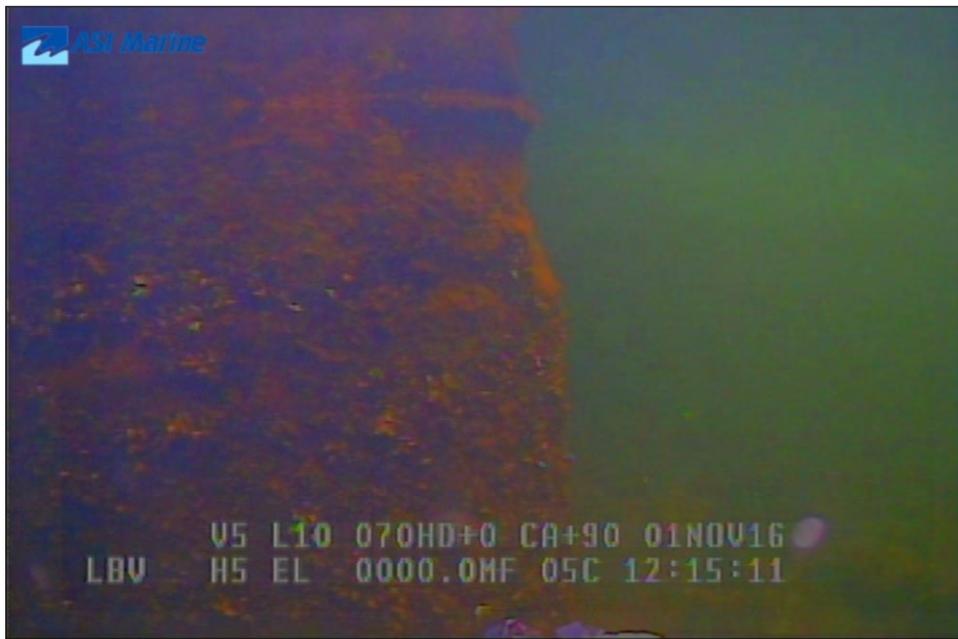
C-08: Pier 8 - Slight spalling below surface.
